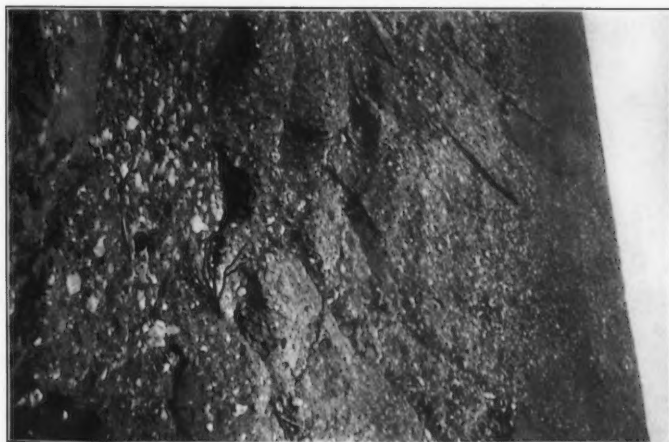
HOLES WORN THROUGH CONCRETE AT FOOT OF SECOND STEP.
